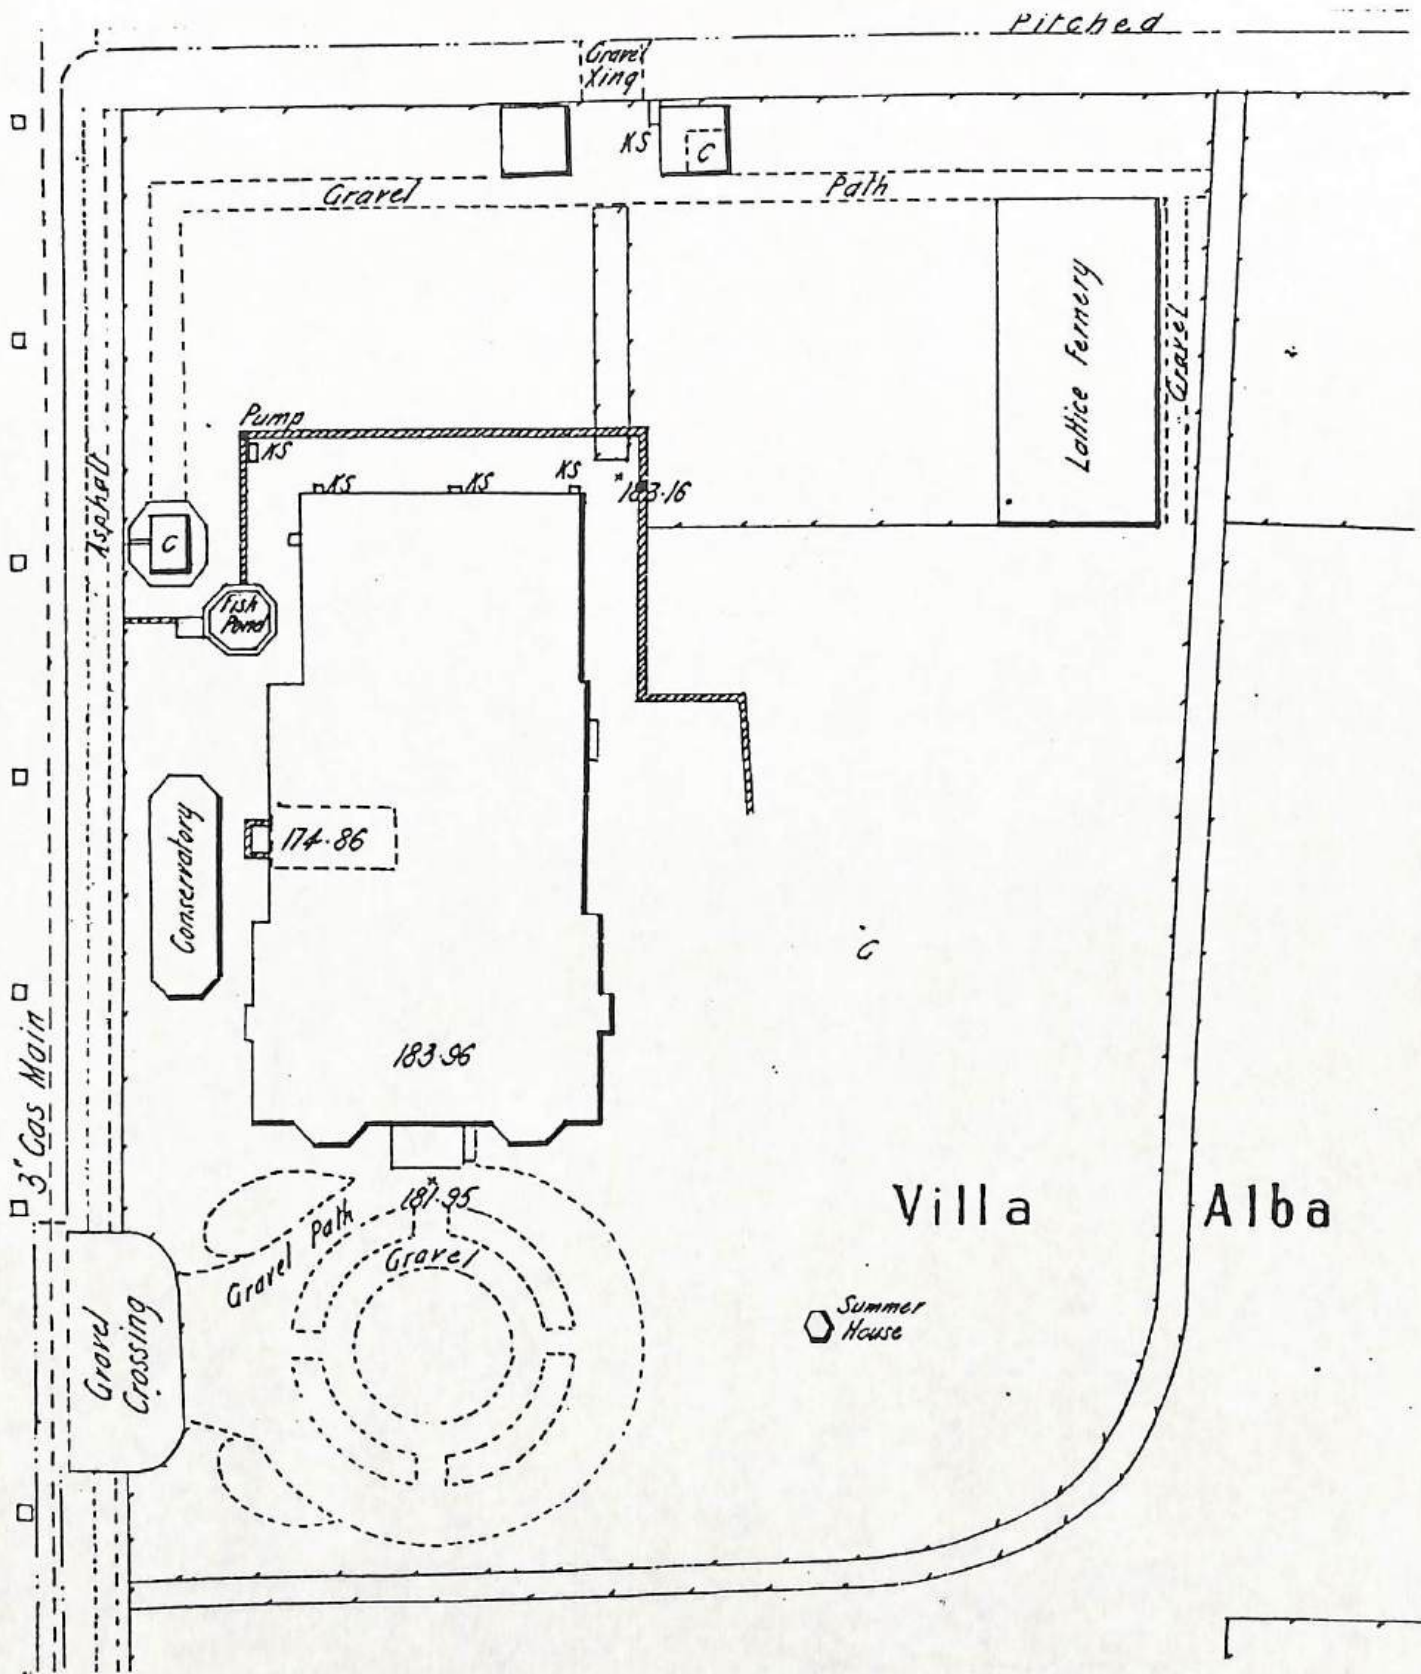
Garden prior to the Billiard Room, MMBW Detail Plan, 1899.
